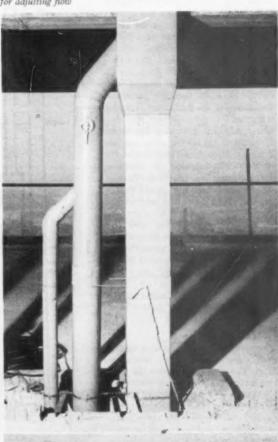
Drainage and ventilation pipes contained in the ducting between flats 2 and 3 in fig. 8. Each set of piping serves two adjacent flats on each floor. Note connections for w.c., bath and basin
